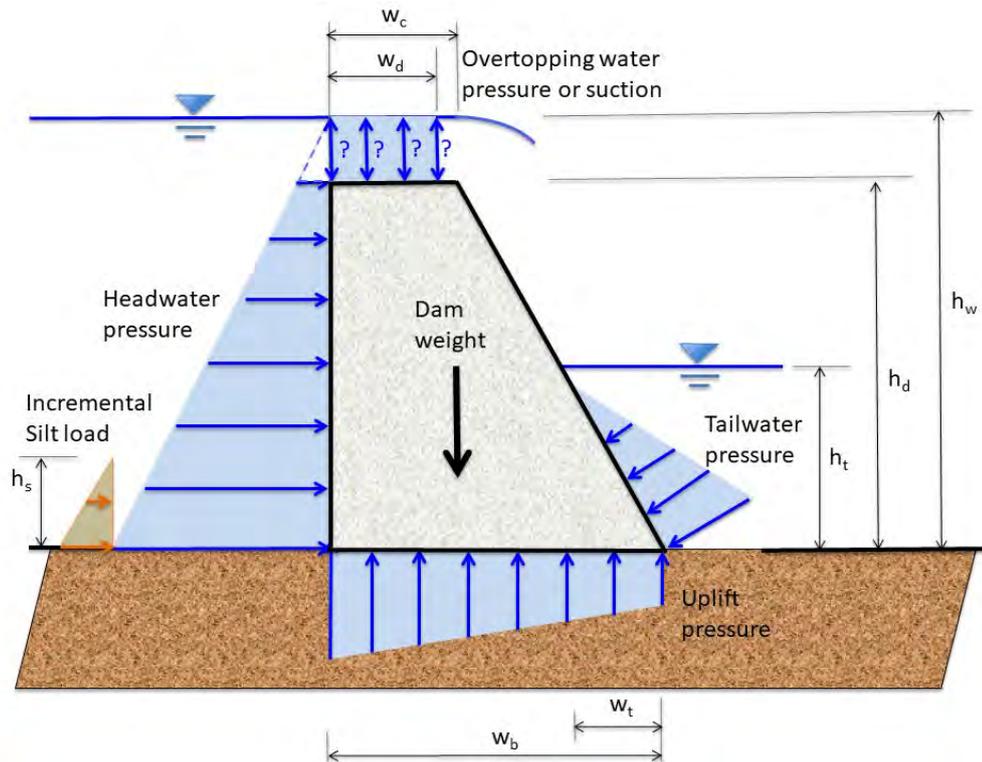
Schematic cross-section through a dam spillway monolith showing the forces assumed to act on the dam. (Exhibit 62. PDI.067.0001)
